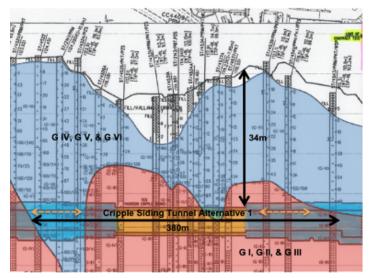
Longitudinal section of subsurface conditions along Southbound Cripple Siding tunnel.
